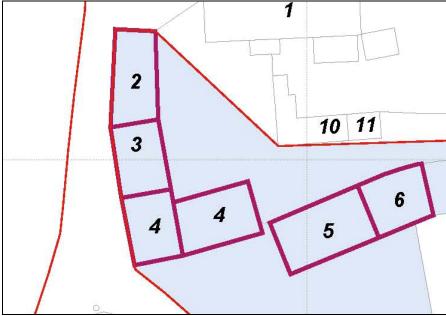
Plan of the buildings at Lower Poole Farm (After WA, Project No. 78080.03)
